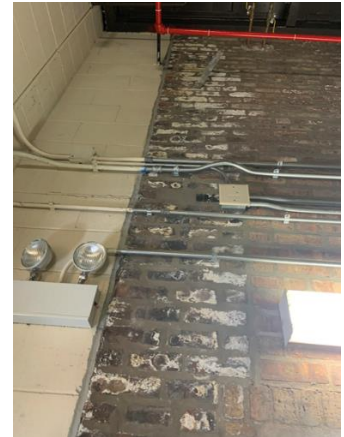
, 12, 13 & 14: Roof leak damage on brick walls showing efflorescence getting into wood structure. Need to repair roof. Then provide 2 layers of 5/8" gyp board for 2-hour enclosure of server room.
